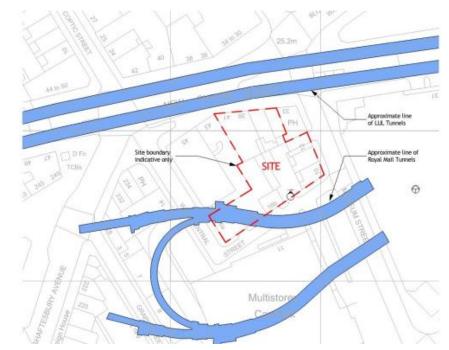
Site plan showing approximate locations of LUL & Royal Mail tunnels
